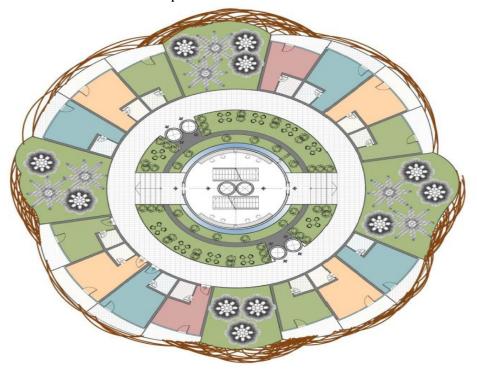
Plan of the floor with one capsule - there is two internal elevators and four external elevators.
